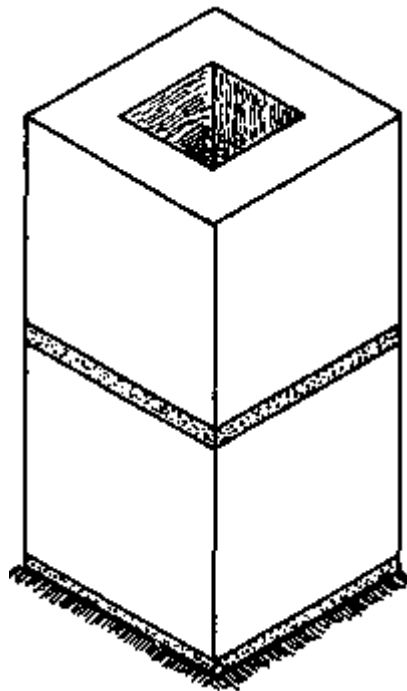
PIER BUILT WITH OPEN BLOCKS
